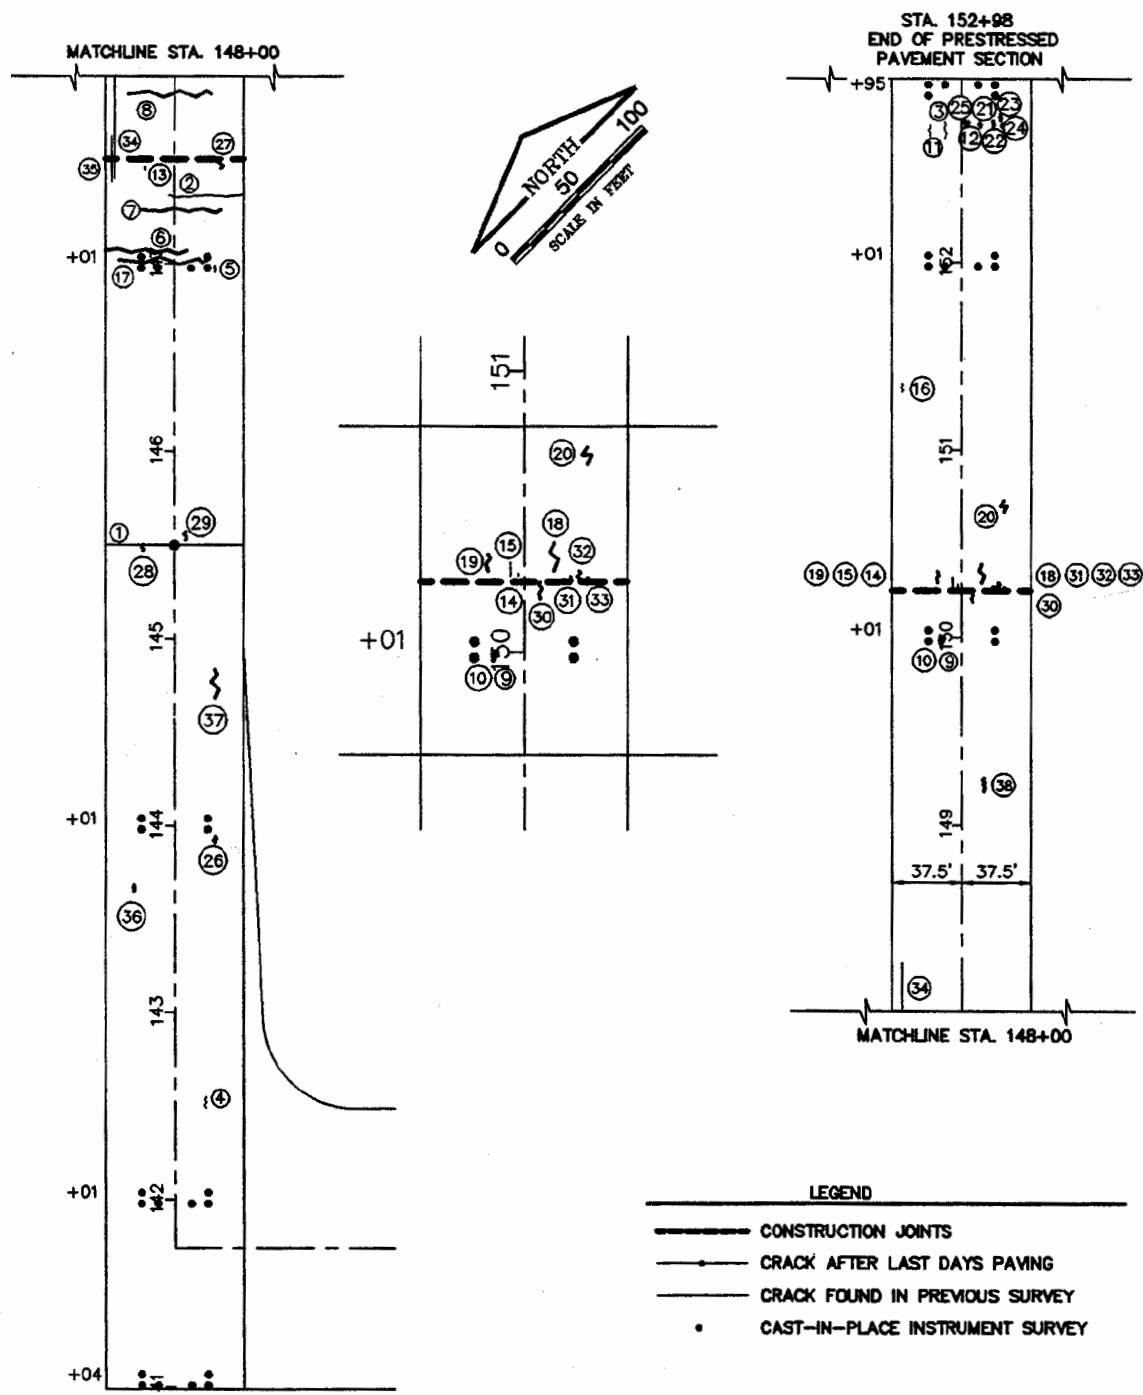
CRACKS IN PRESTRESSED CONCRETE PAVEMENT, SUMMER 1998
